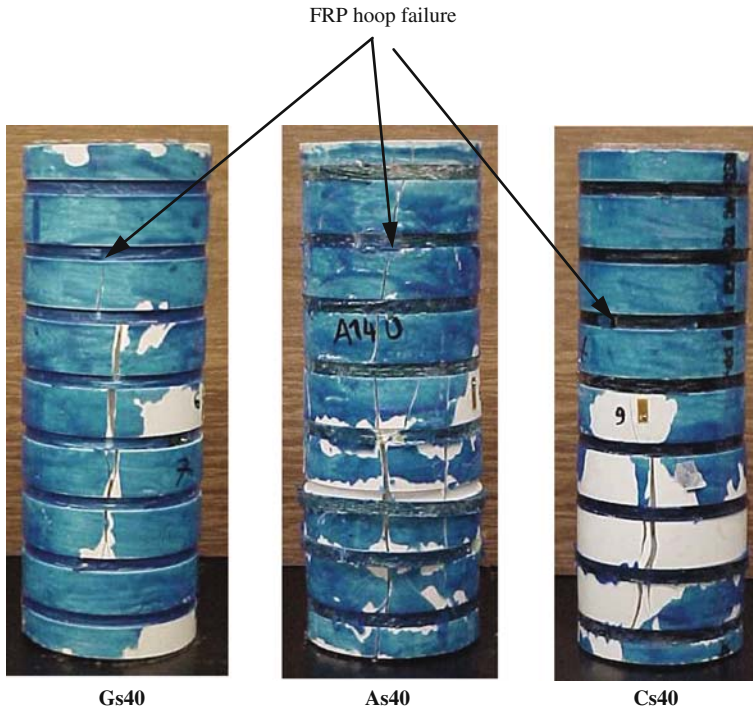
Typical failure mode of PVC-FRP confined concrete specimens (See also Plate 8 in Color Plate Section on page 459)
